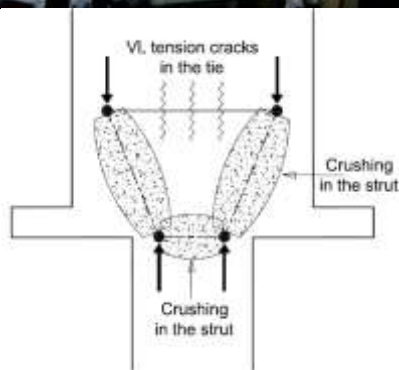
Typical failure pattern of C2a, C3a, and C4a
